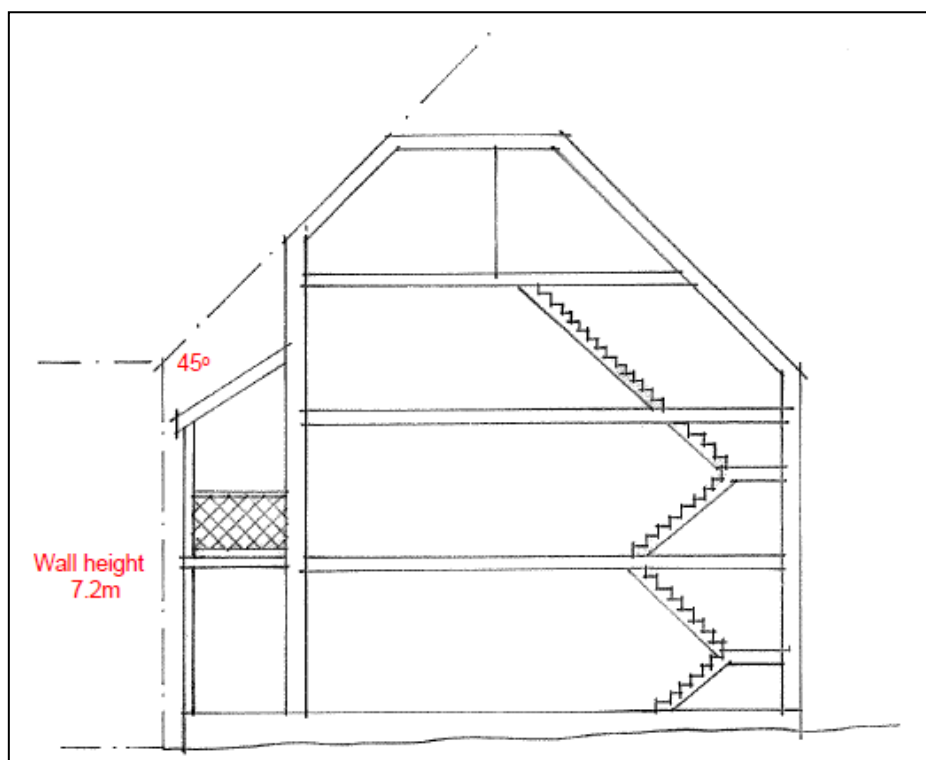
Building envelope – 7.2m wall height – three storeys, to a scale compatible with grander terraces or mansions, or when the wall height is used as a parapet.
